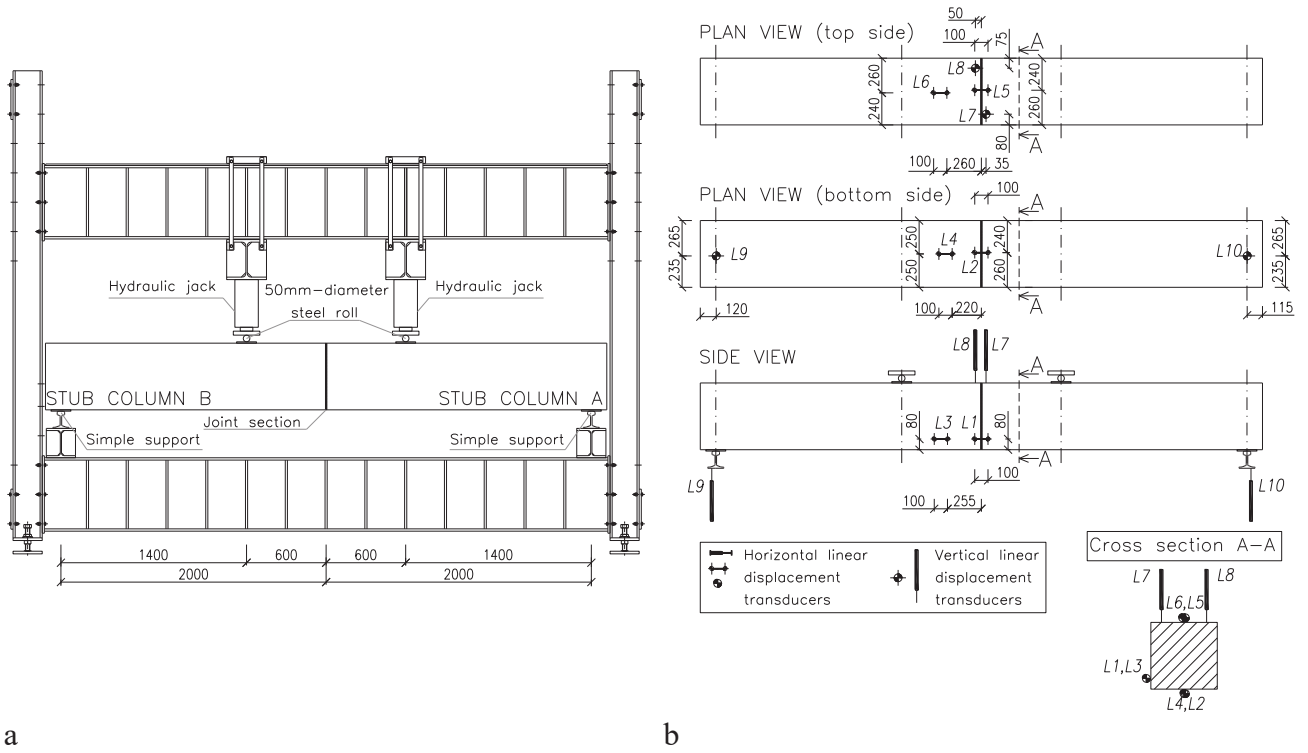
Four-point bending test: (a) test setup (side view) and (b) locations of the linear displacement transducers. Dimensions in mm.
